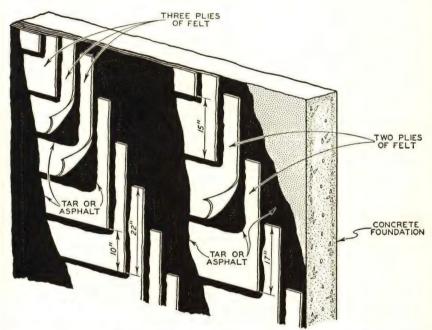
Method of Lapping Three and Two Layers of Felt Waterproofing for Foundation
